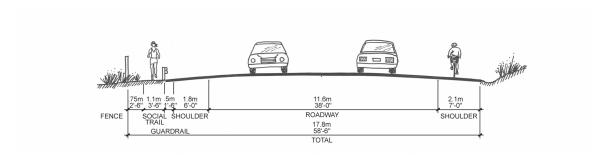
Existing Condition at Lincoln Boulevard at Kobbe Avenue
